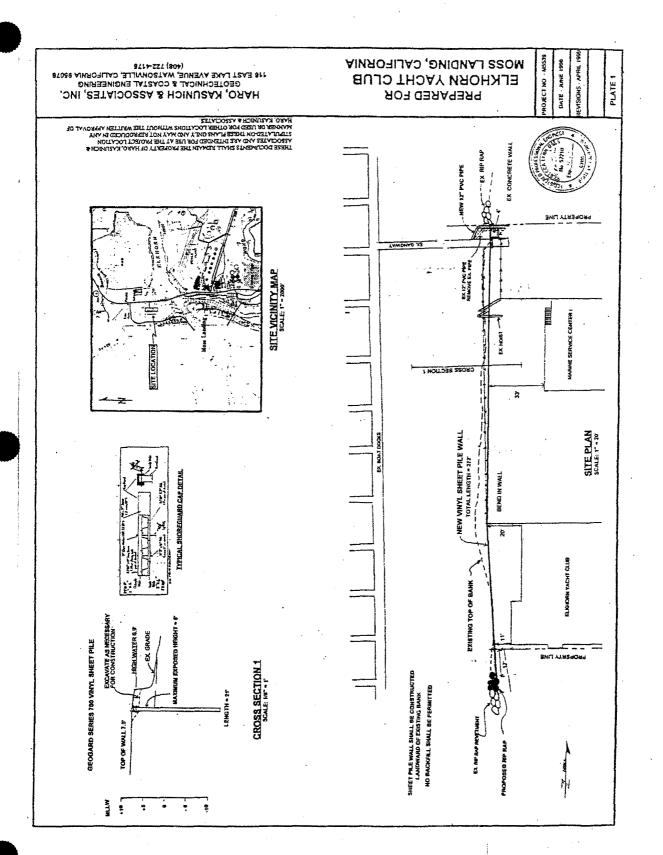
Exhibit C Site Plan and Cross-section: Elkhorn Yacht Club Moss Landing, California CDP # 3-98-069
